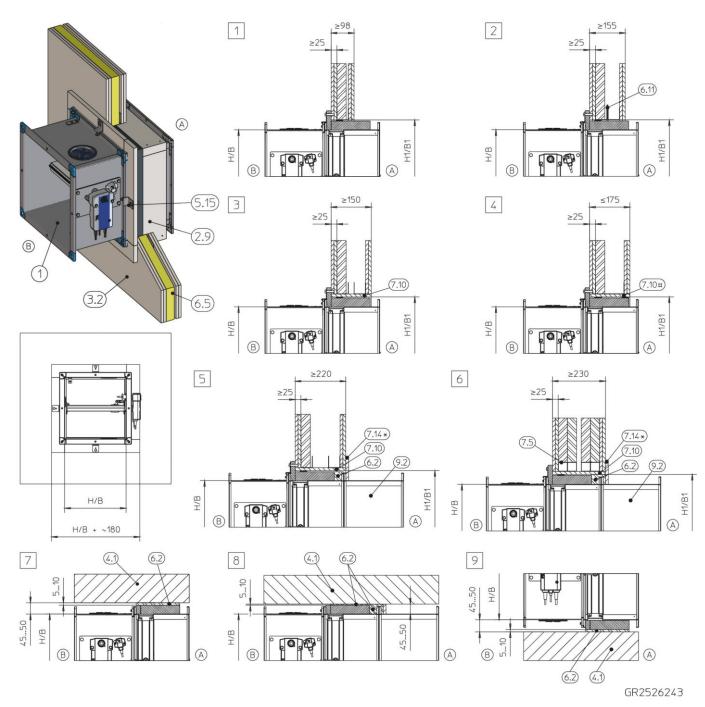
Dry mortarless installation into a lightweight partition wall, with installation kit ES
